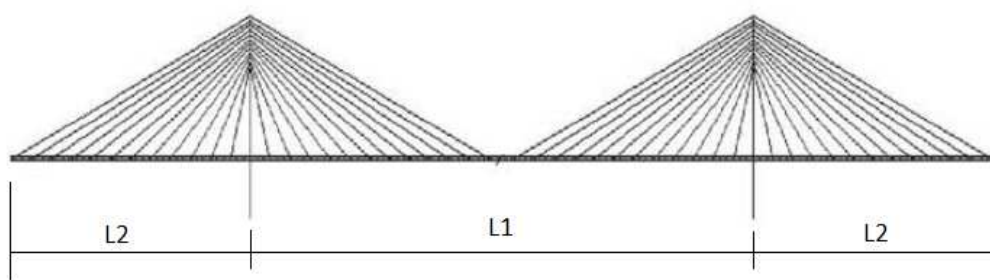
Typical Side View of a Cable Stayed Bridge
